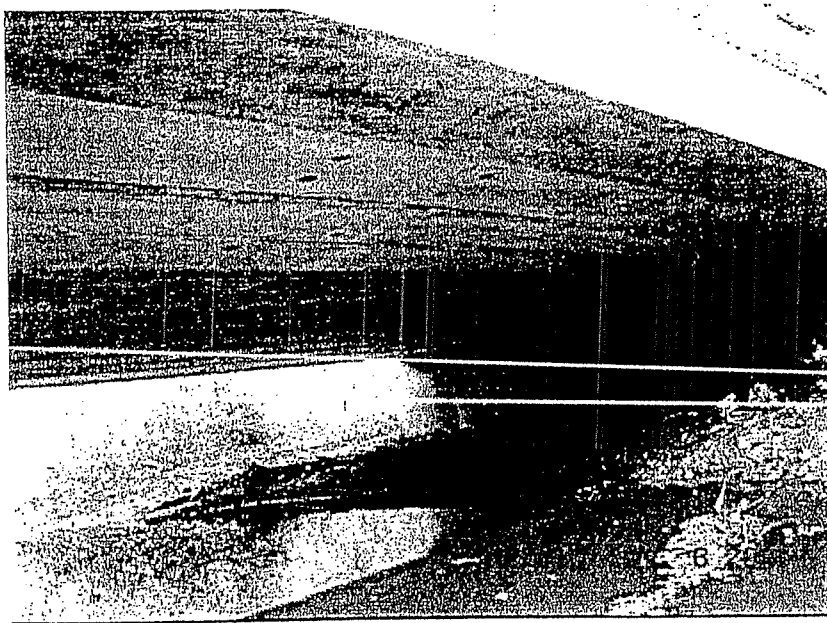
Underside View of Hollow Core Bridge Deck, Illinois
